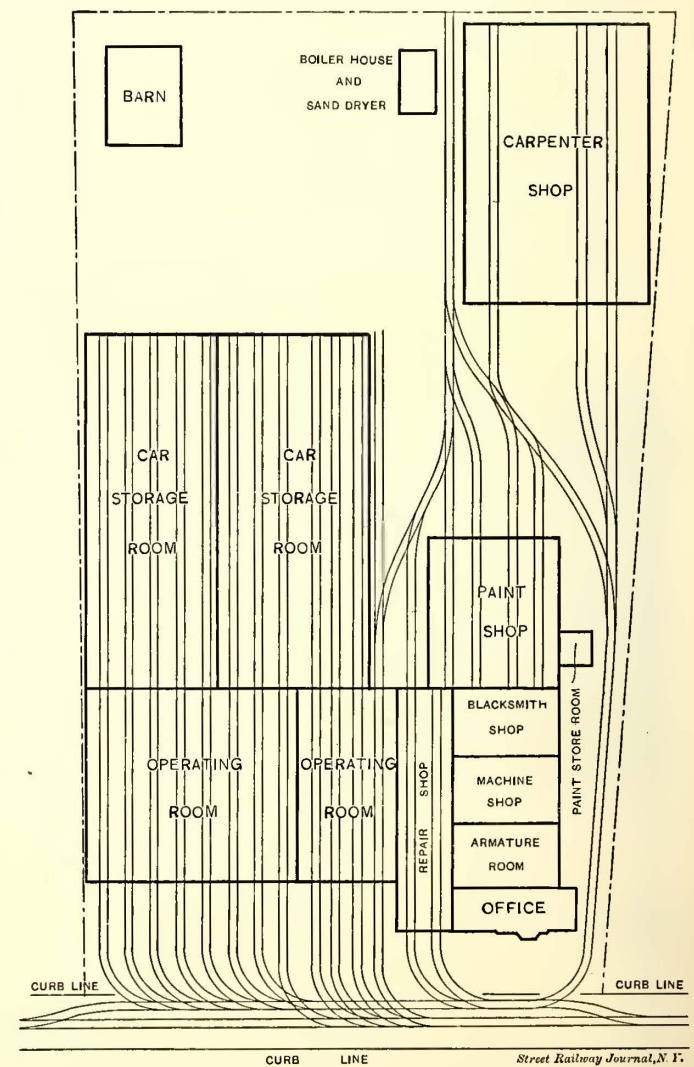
PLAN OF BUILDINGS—VERNON STREET
